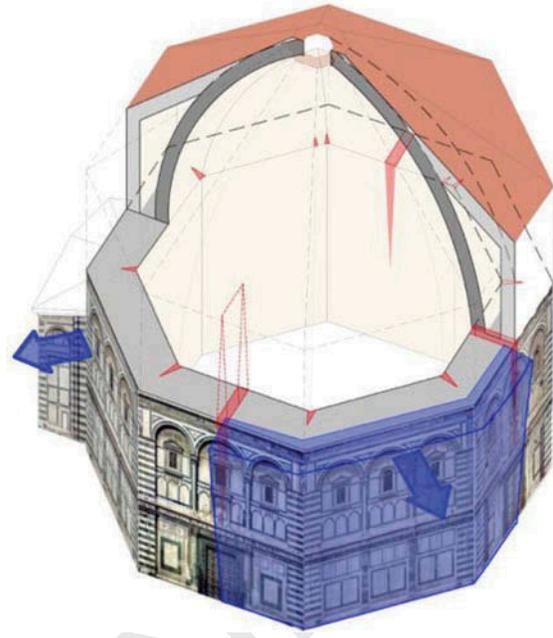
The widespread crack pattern of the Baptistery dome is due a system of structural disorders and deformations which is typical of domed buildings.
